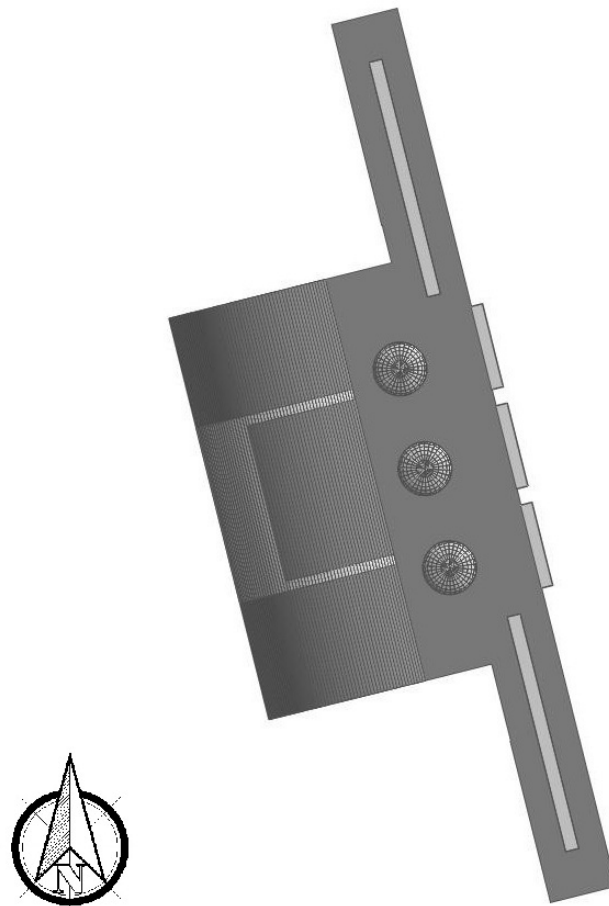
A View Plan of ADM Building Modeled in DesignBuilder.
